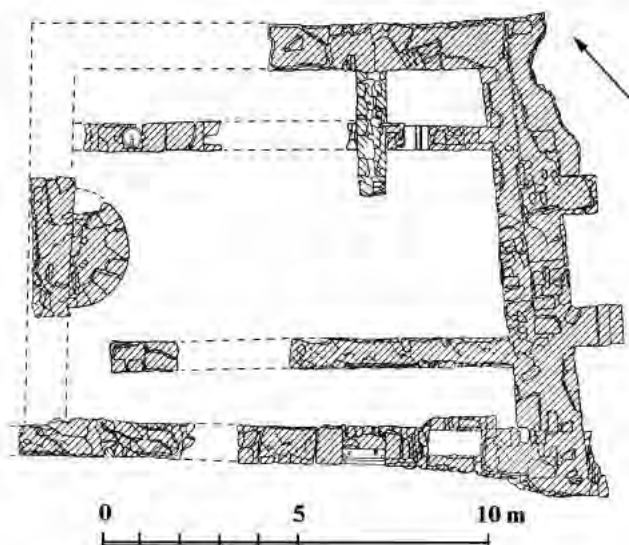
Christian Basilica in Tyritake. Excavation Plan (after V. Gaidukevitch [97, fig. 1]). Most walls are foundations. Neither apse nor narthex were found.
